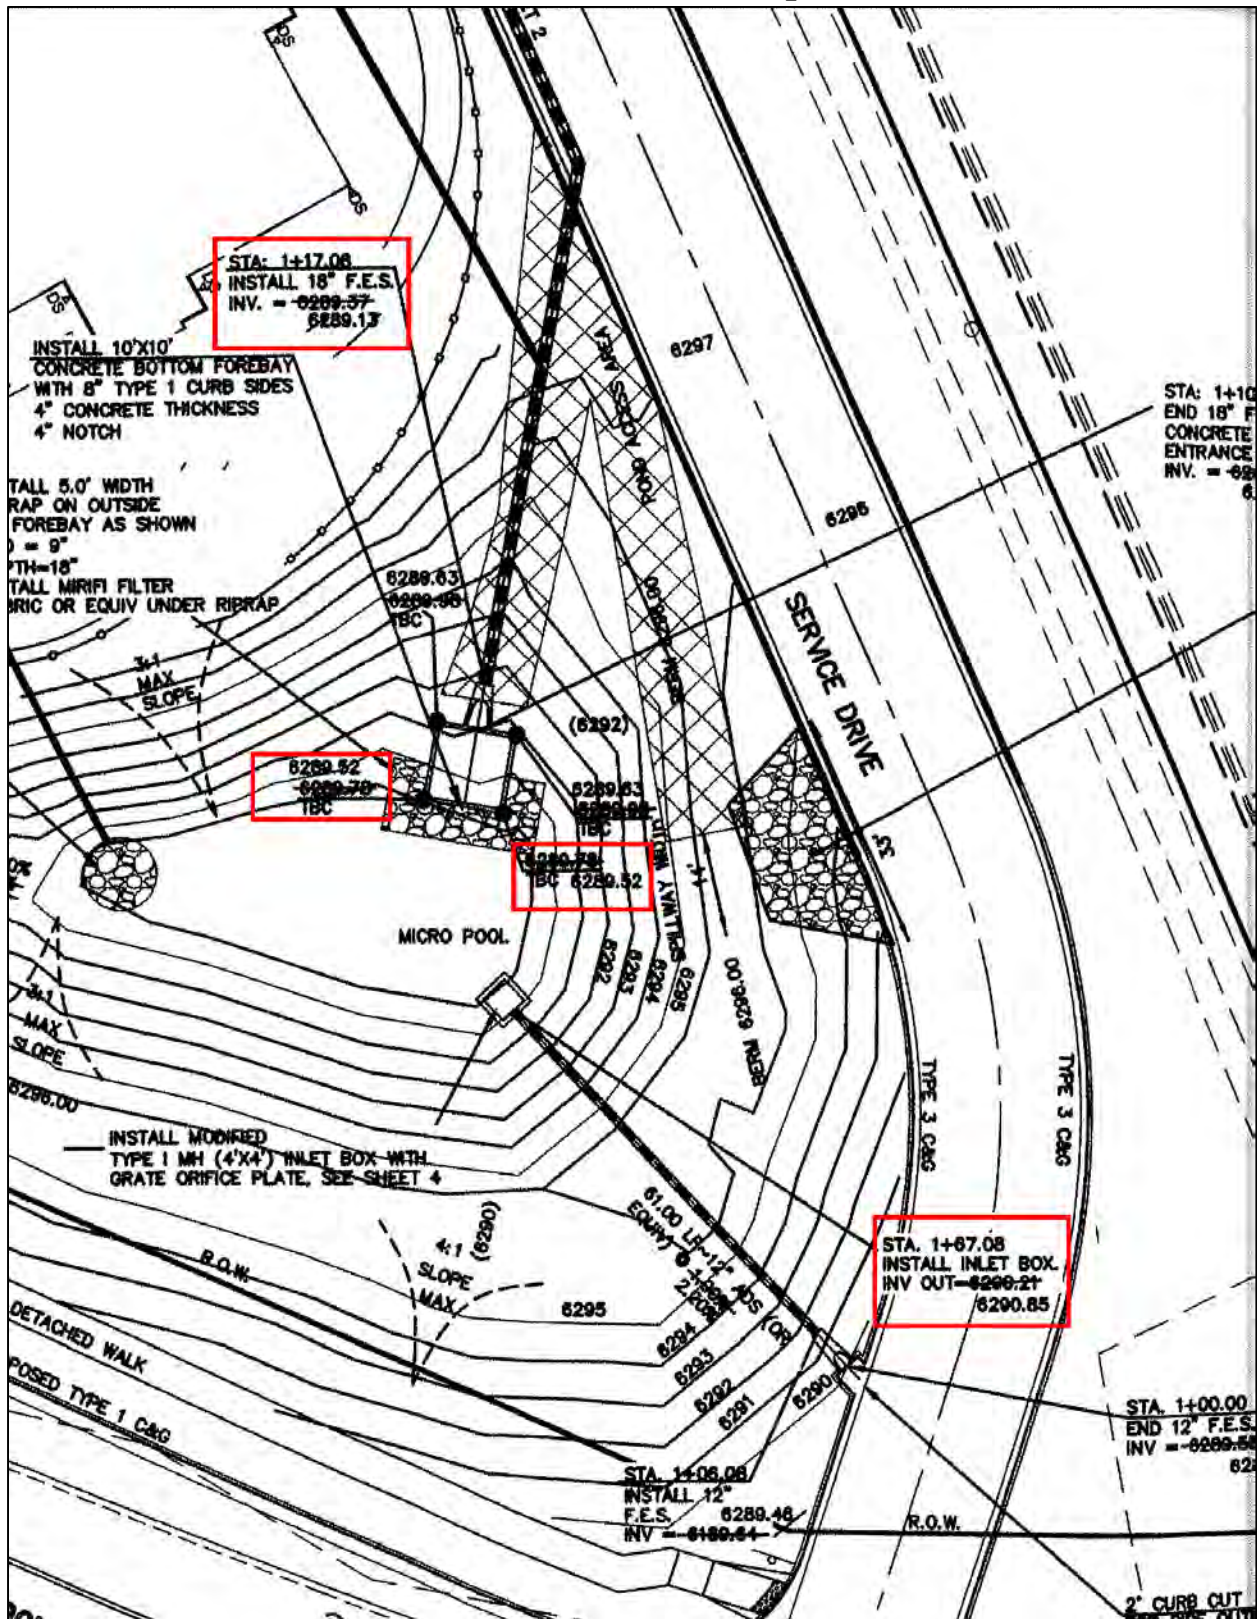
Scan of ID-158 Morning Star at Bear Creek EDB as-built plans (dated October 3, 2014; Sheet 1 of 2) provided by Joel Mackey (City Engineering Inspector). Note that the approved design and as-built elevations of the inlet pipe and forebay were approximately one foot lower than the outlet pipe invert resulting in an impaired forebay and drain time for WQCV.
